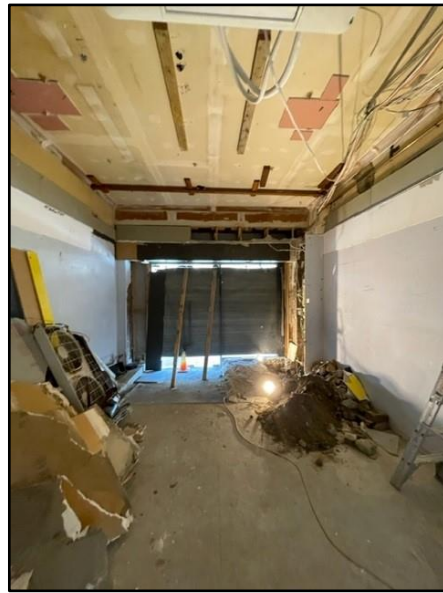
Interior view of the ground floor commercial space, facing north towards the Corso. (Source: Heritage 21)
